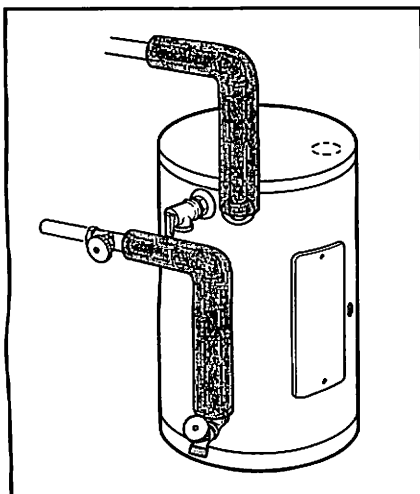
Typical Side Connect piping arrangement. (Your installation may vary slightly.)
